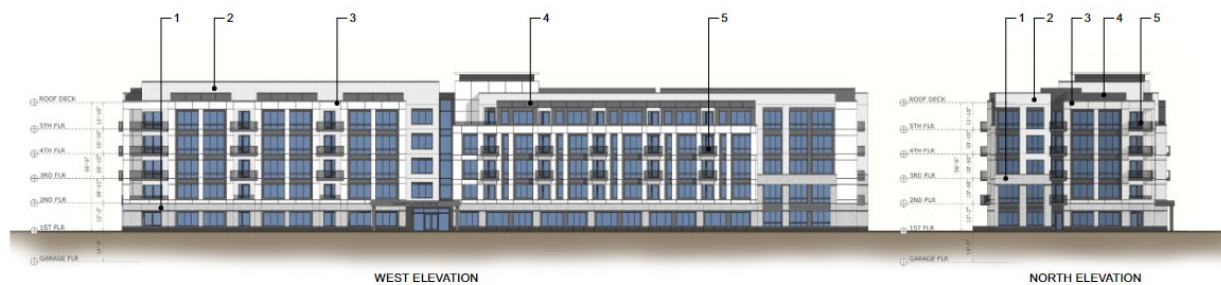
West Elevation (main entrance), and North Elevation (fronting Sentinel Drive)
